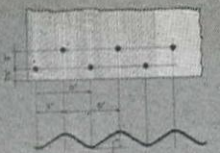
Longitudinal Edge of an American Section Plate with reinforcement details and spacing.
